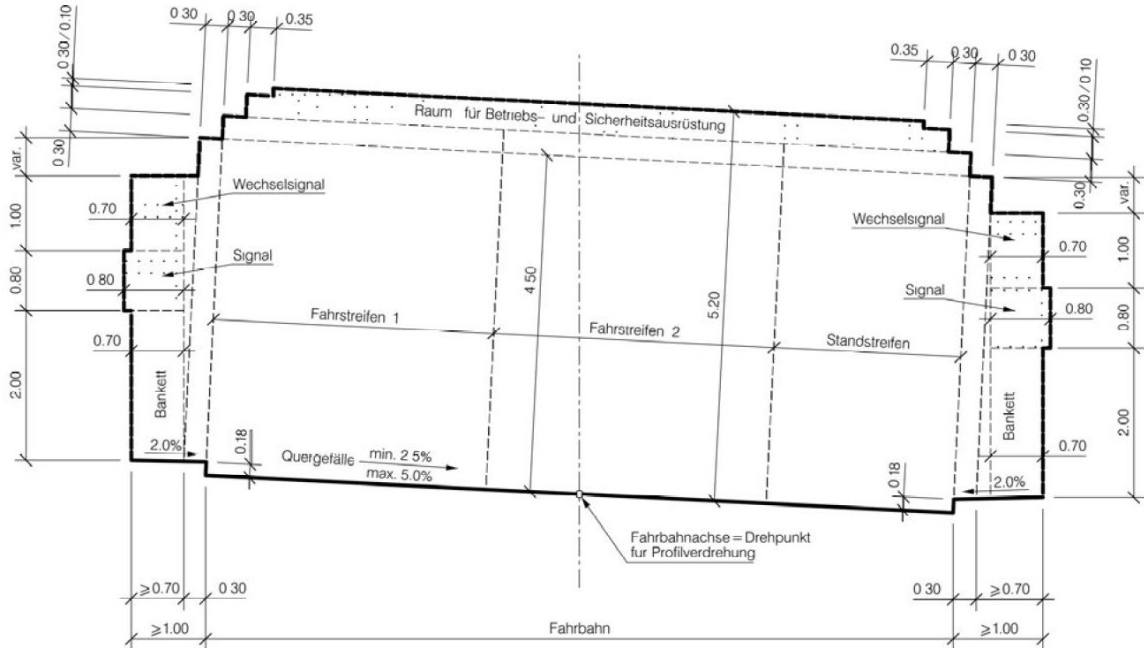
Operational envelope for traffic according to SIA 197/2 Design of Tunnels – Road Tunnels
